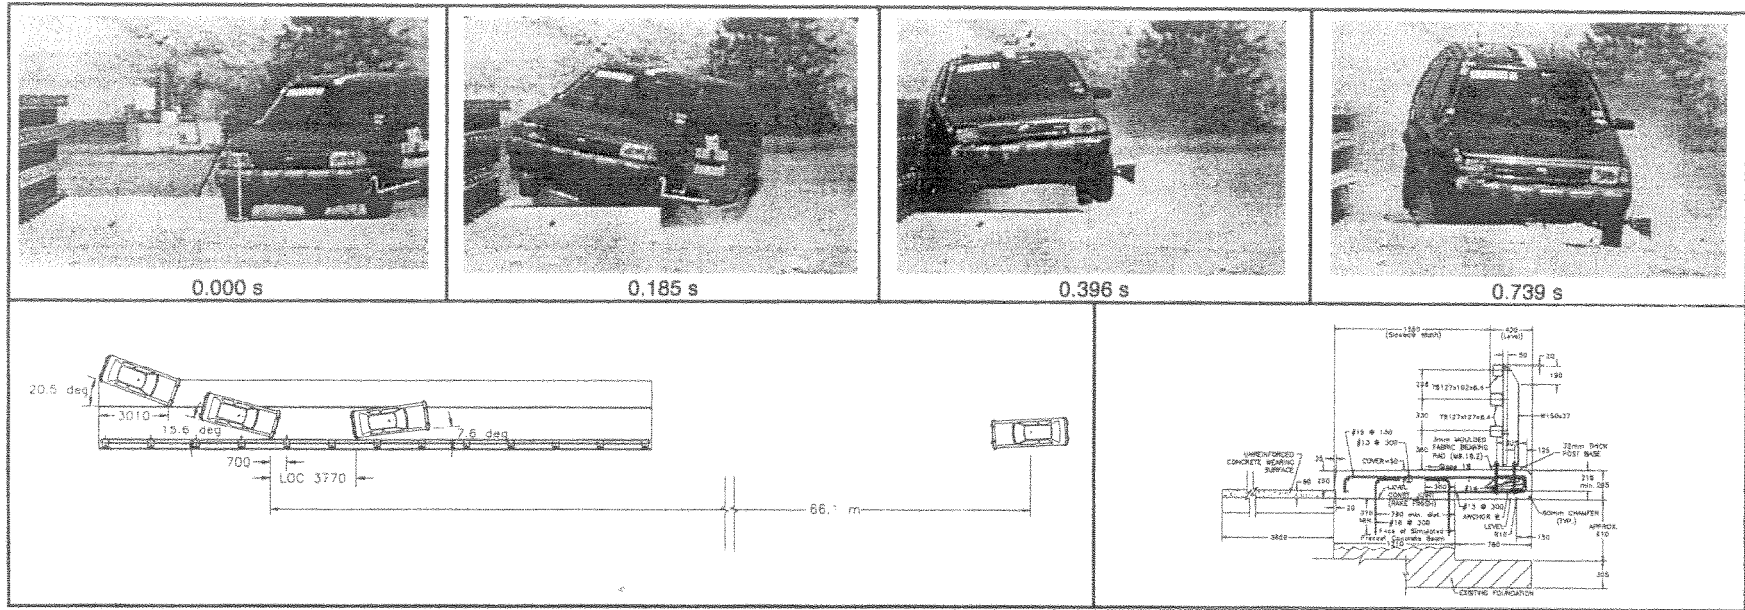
Details of the Massachusetts Type S3-TL4 Bridge Railing mounted on safety curb used for tests 404251-5 and 6.
